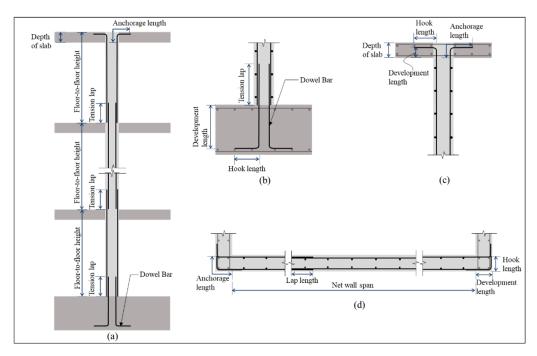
Characteristics of wall rebar: (a) typical arrangement of vertical wall reinforcement; (b) dowel bar at foundation; (c) top anchorage rebar with hook at top slab; (d) hooks at wall connections (adapted from Kim et al. [45]).
